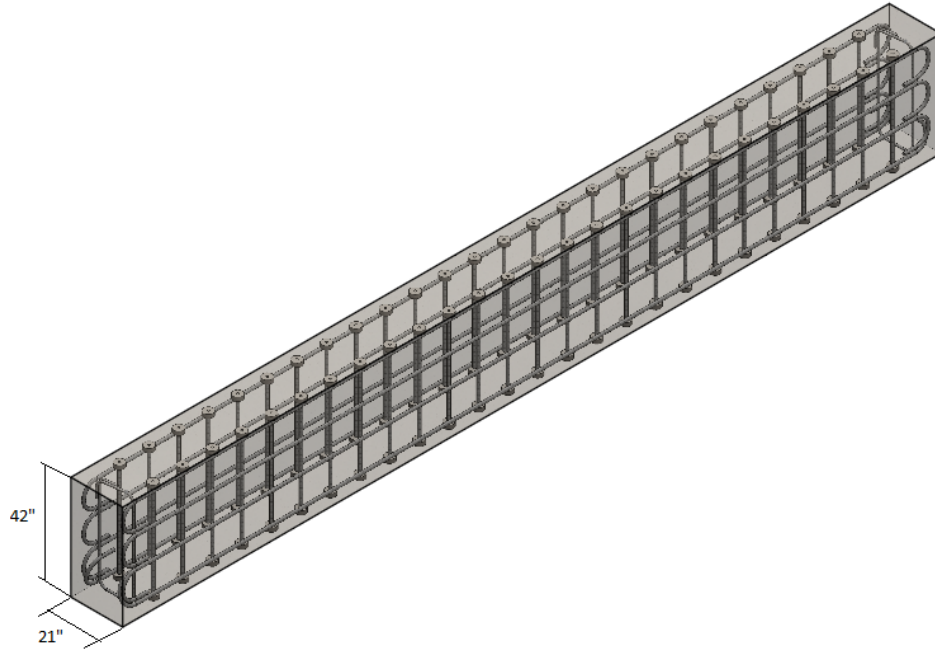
Specimen Dimensions and Reinforcement Layout
